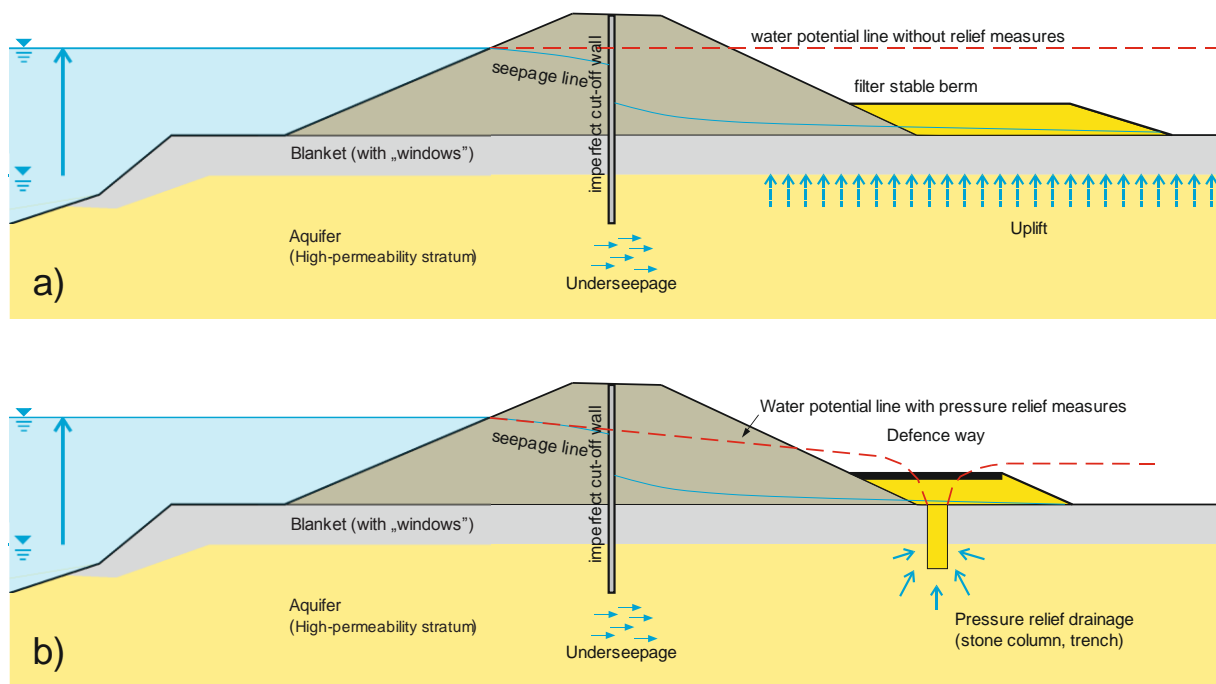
Permanent measures against hydraulic failure caused by underseepage of flood protection dykes: a) Filter stable berm as a counterweight; b) Relief drainage columns or trenches.
